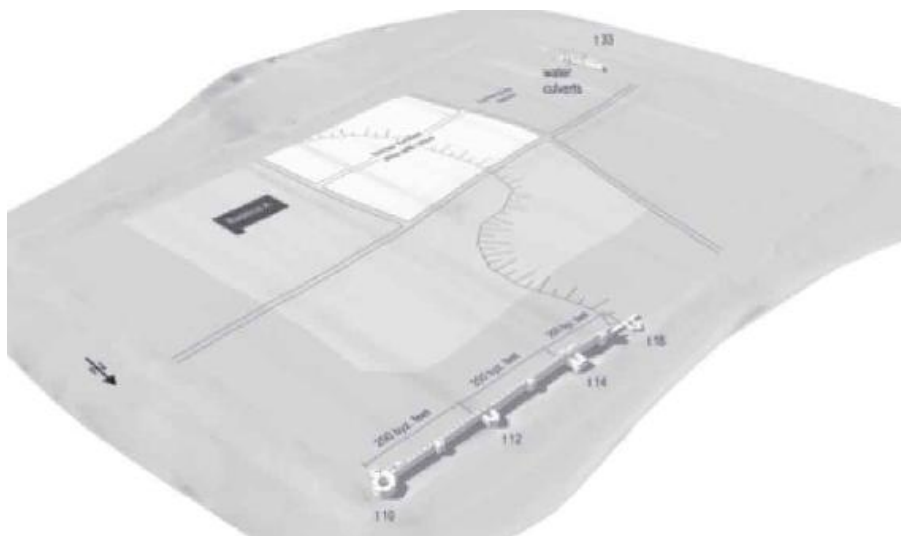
Resafa, city wall, reconstruction of building stage 1. Prototype stretch of the wall (t 10–t 16) and autonomous piece (t 33–t 34) at the hydraulic installations (dam, canal, water culverts, cistern) (N. Erbe & C. Hof).
